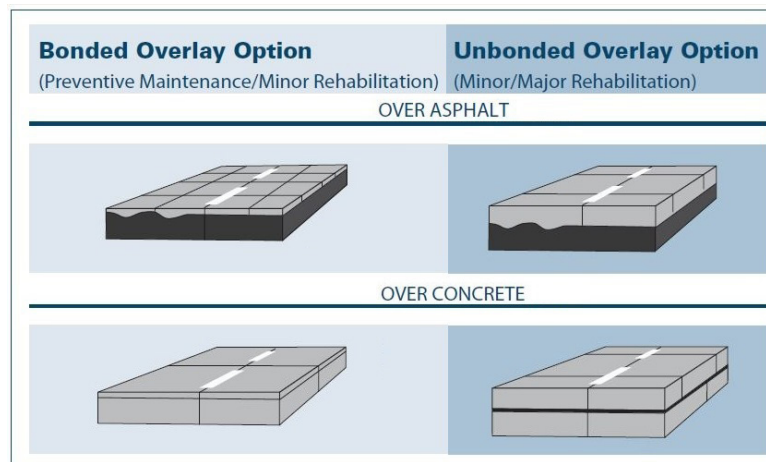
Concrete overlay segments (adapted from Guide to Concrete Overlays, Third Edition, Harrington and Fick 2014)
